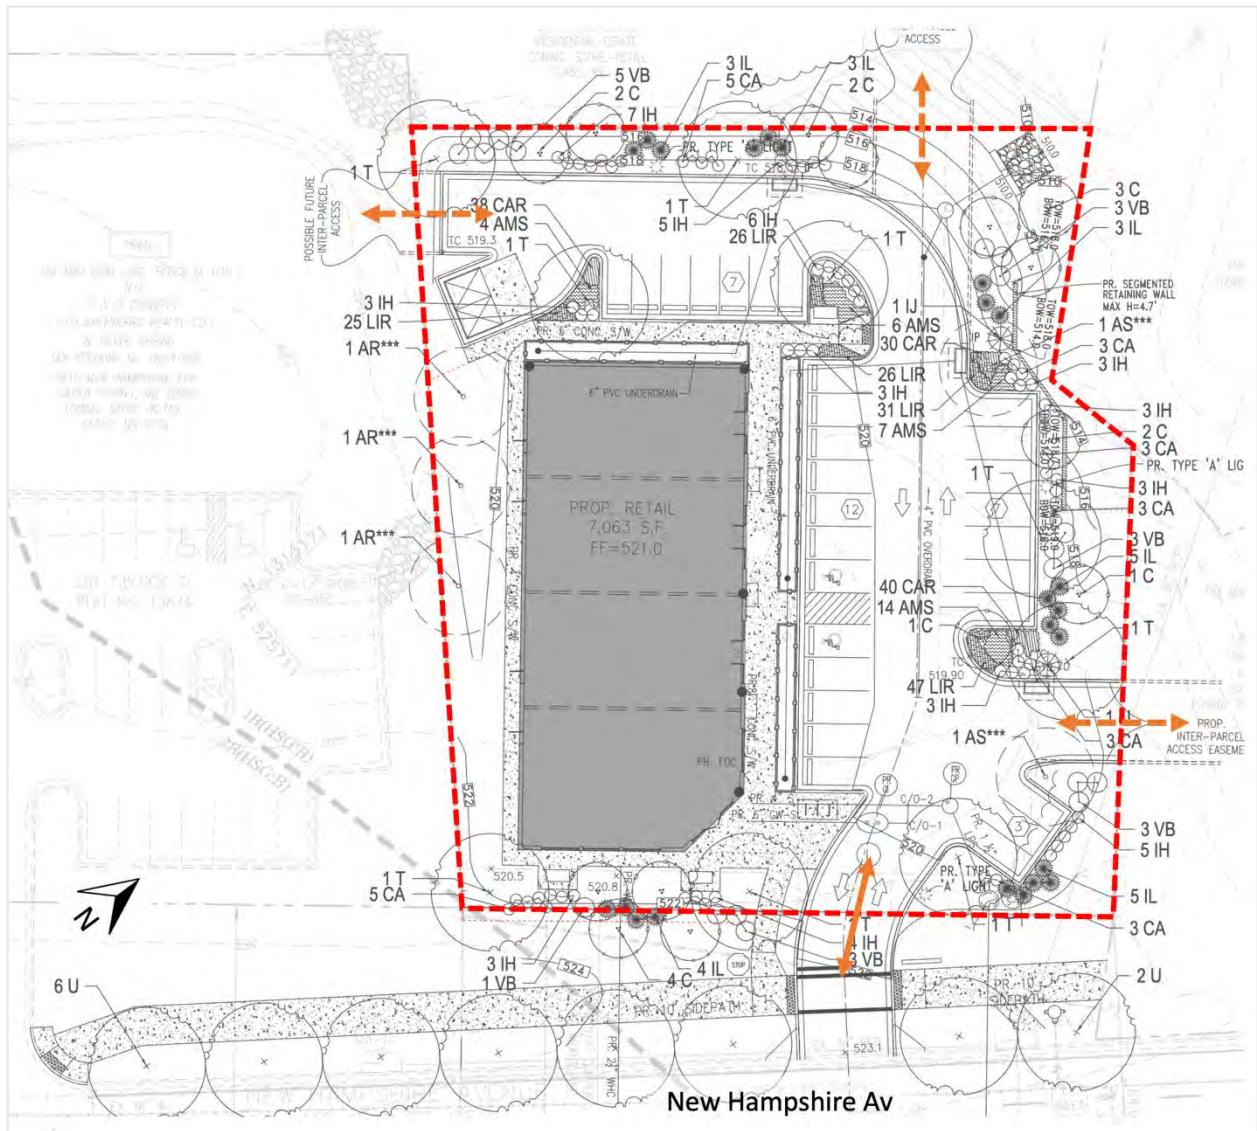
Proposed Preliminary Plan Amendment, landscaping, street trees, three future inter-parcel connections, and a 10 foot-wide sidepath improvement
